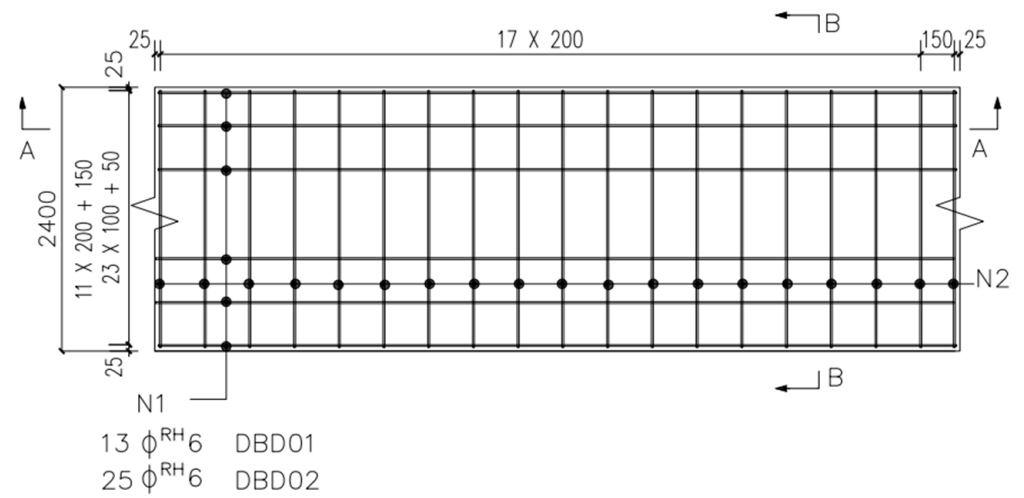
Reinforcement diagram of sandwich laminated floor slab (unit: mm).
